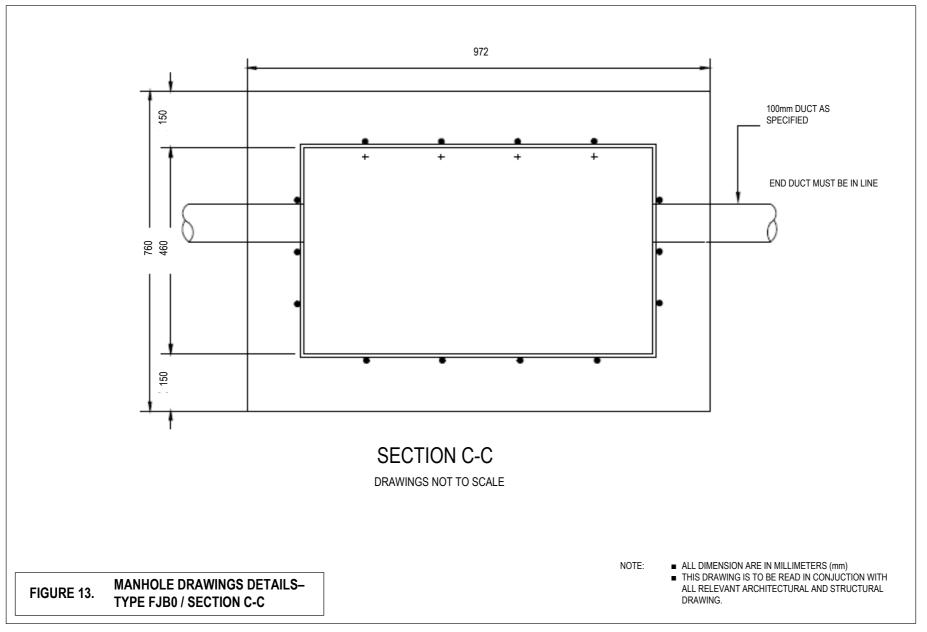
Manhole drawings details – Type FJB0 / section C-C
